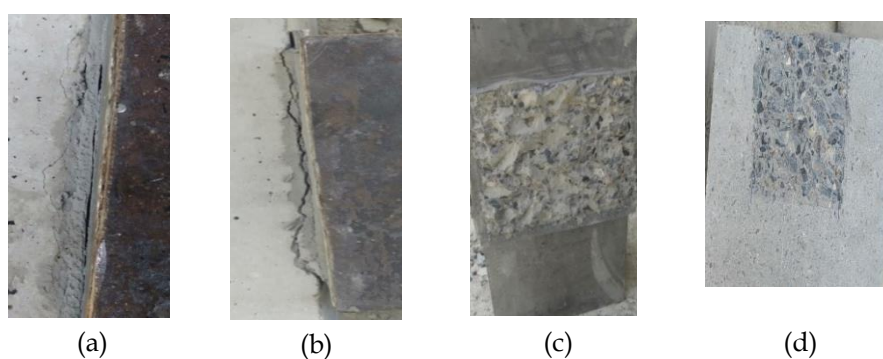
Adhesive bonded steel-concrete composite specimen connection interface failure; (a) crack initiation near the epoxy-concrete interface, (b) crack leading to final failure and the consequent separation near the interface and (c) concrete layer separation at the interface
